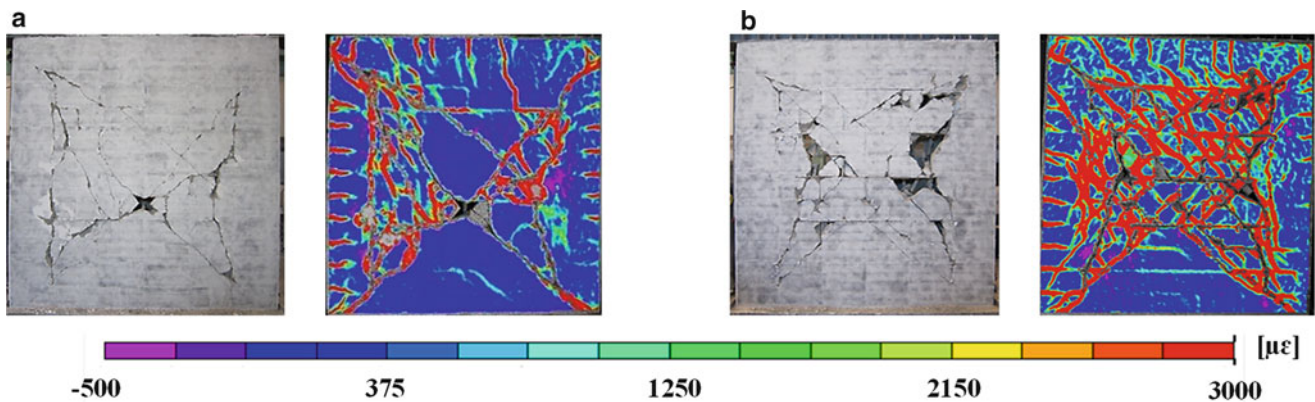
Failed specimen photograph and final DIC crack map: (a) specimen WU; (b) specimen WR
